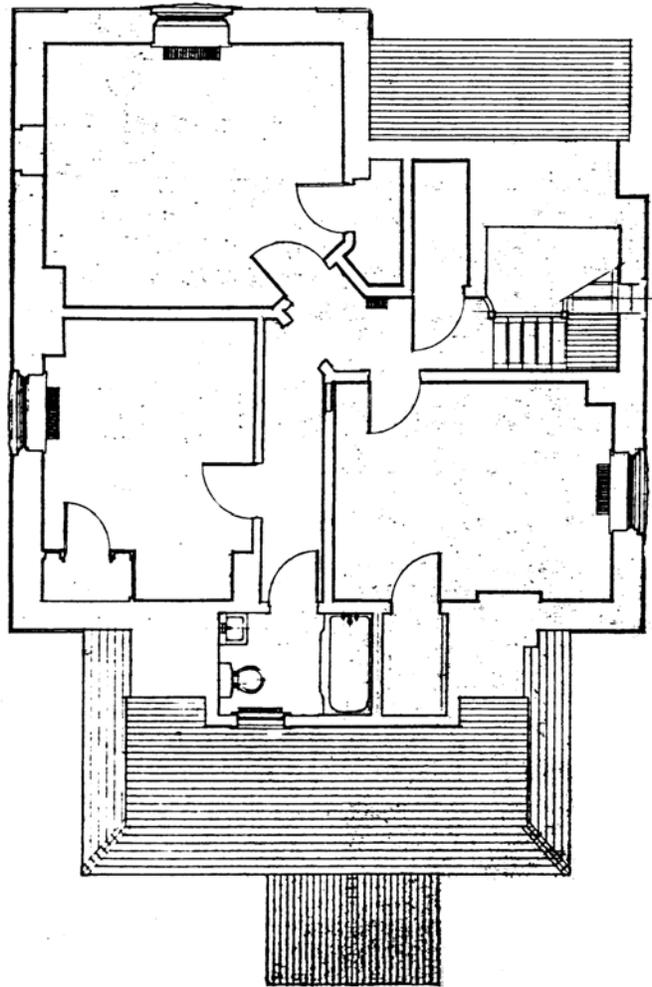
Layout of a second floor plan, Keeper's Quarters (East House), Devil's Island Light Station, Apostle Island National Lakeshore, Bayfield, Wisconsin.
